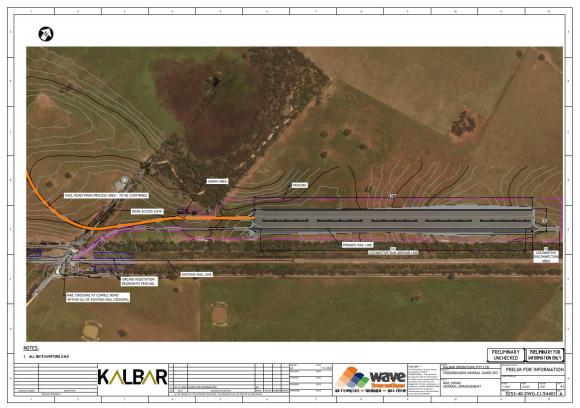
Concept plan for Fernbank Rail Siding⁴⁰
